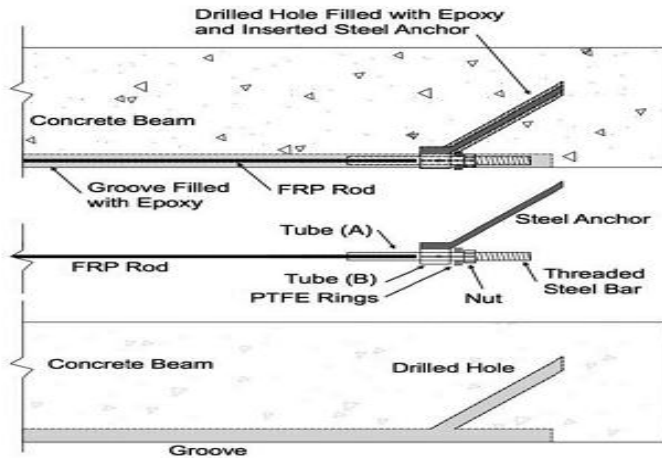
Schematic diagram of the setup and prestressing system (fib – federation internationale du béton, 2007)
